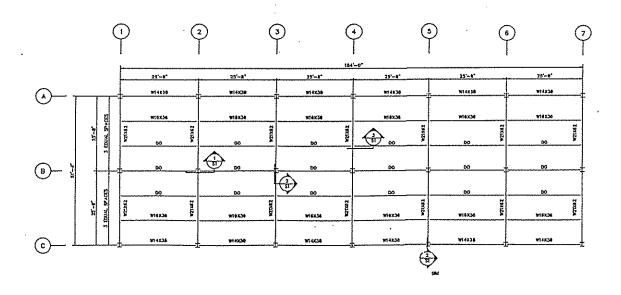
PLAN OF THE PROTOTYPE BUILDING
